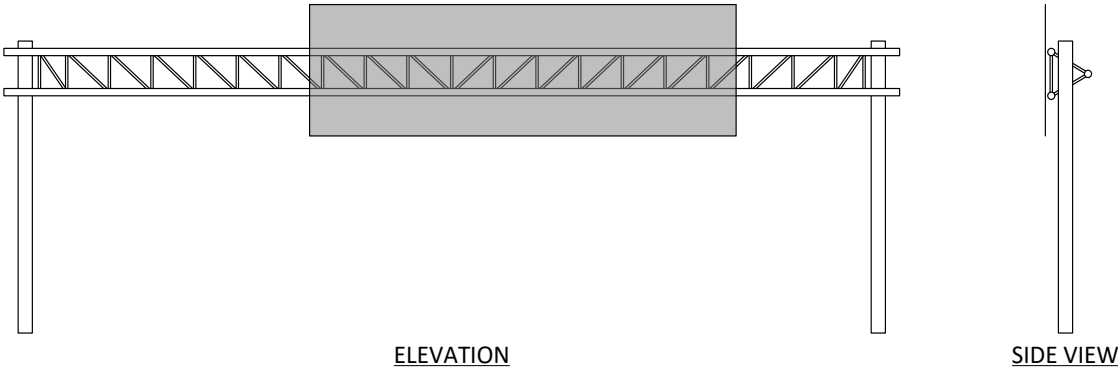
Two Post Tri-Chord Truss (Model Type 1)
